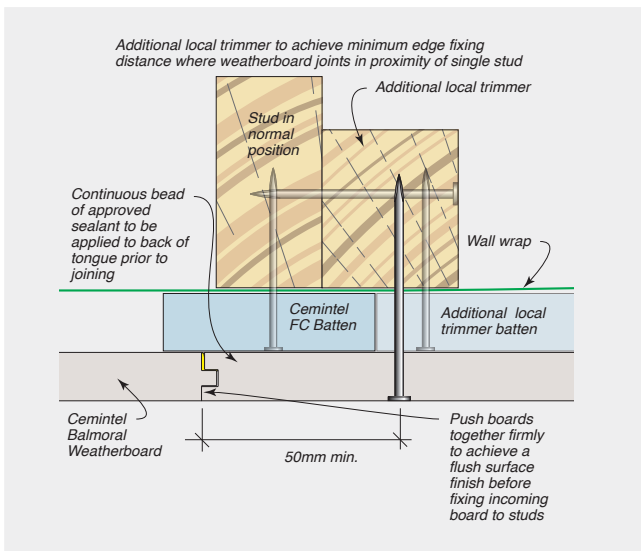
Typical Vertical Joint Aligned to Timber Stud with Local Trimmer
